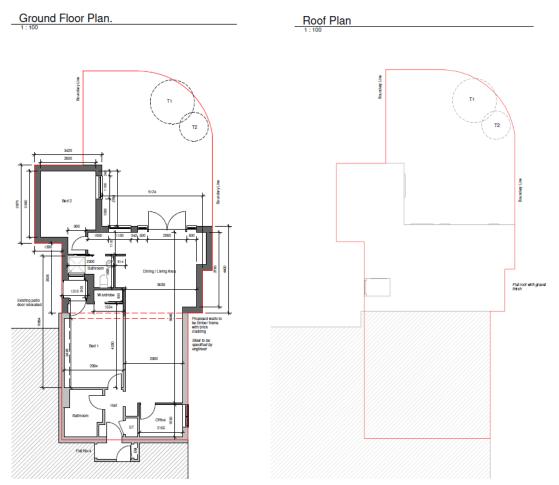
Proposed Ground Floor and Roof Plan showing rear extension and interior alterations
